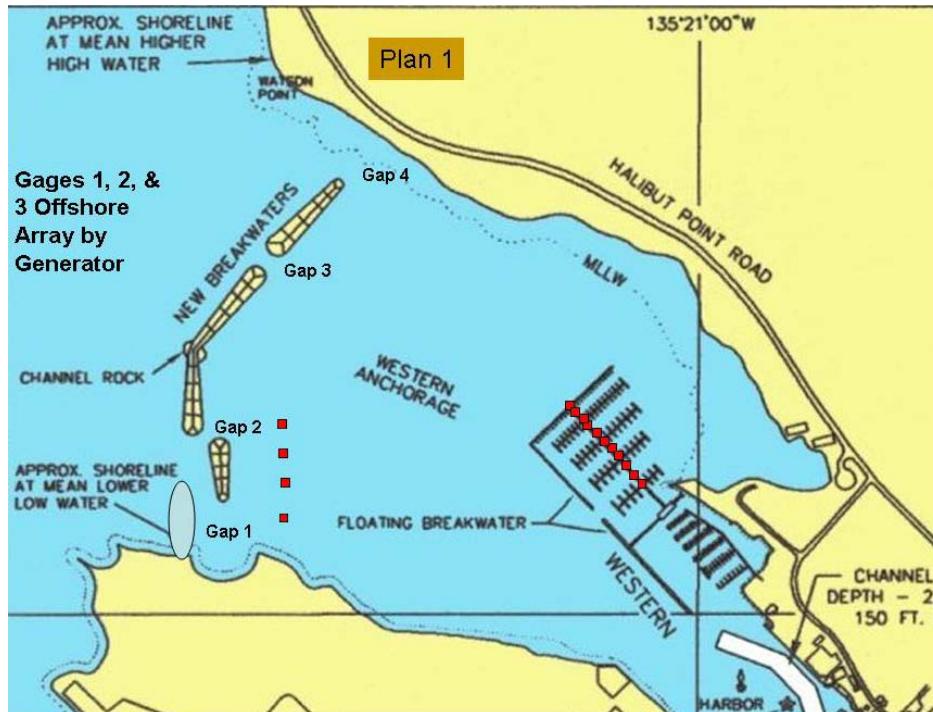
Plan 1 is a 500-foot-long breakwater extending north from Japonski Island.
